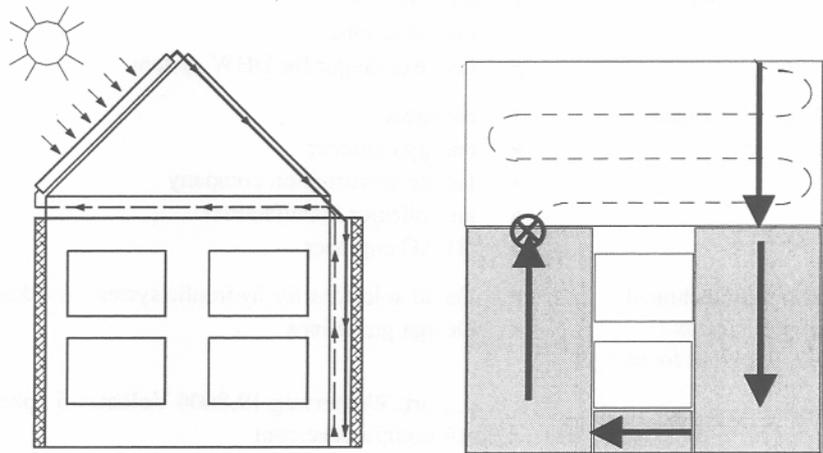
Hydraulic schematic. Air collectors on south oriented roof and airflow through north roof and north oriented facade.
